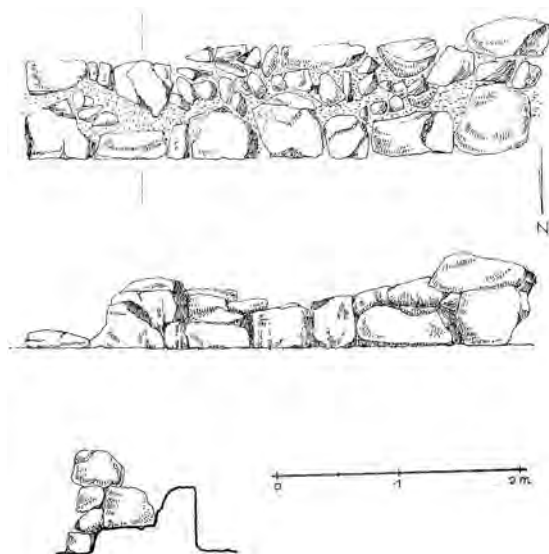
The wall at the right bank of the Artanula river, plan of lower structure exterior masonry (drawing G. Kipiani and M. Akhalaia, 2014).
